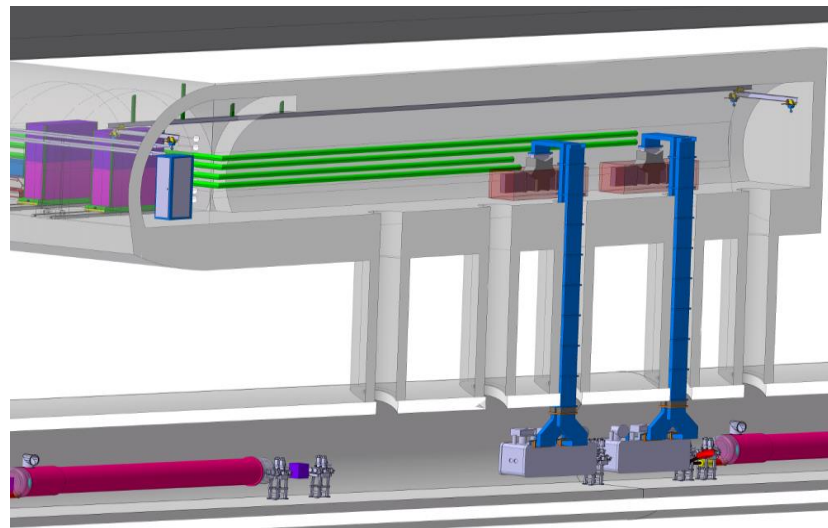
Preliminary sketch of a high-power RF, controls and LLRF layout in the underground RF cavern.
